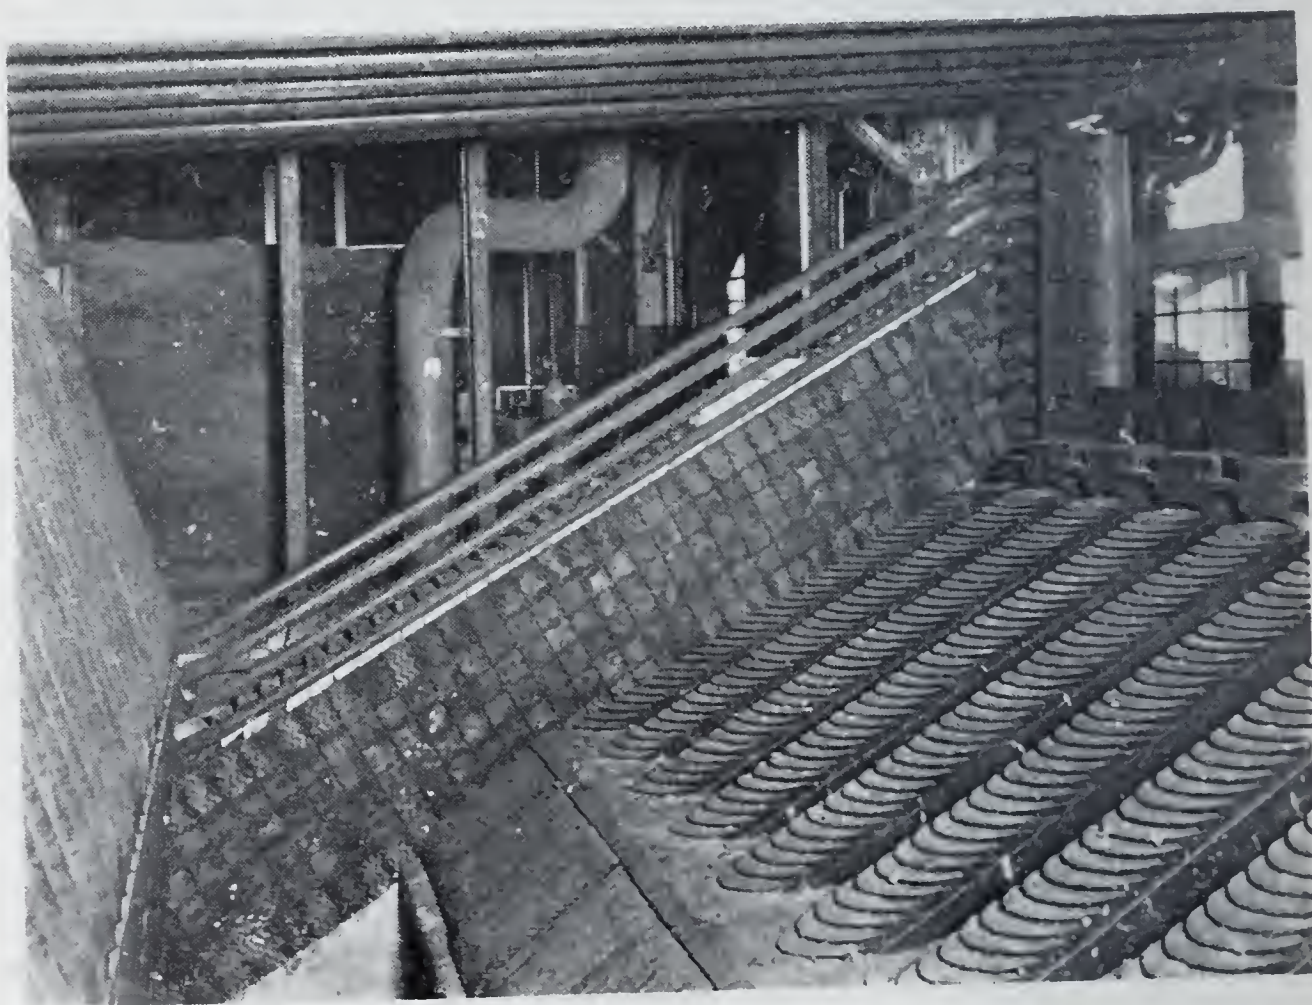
Block-Covered Side Wall with Bare Tubes Forming Slag Drip.
